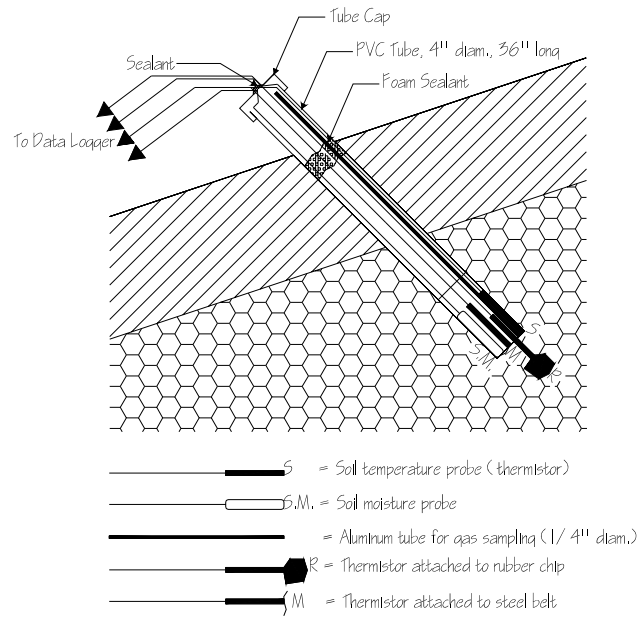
Typical Cross-section of Instrumentation in Mixed Section (not to scale)
